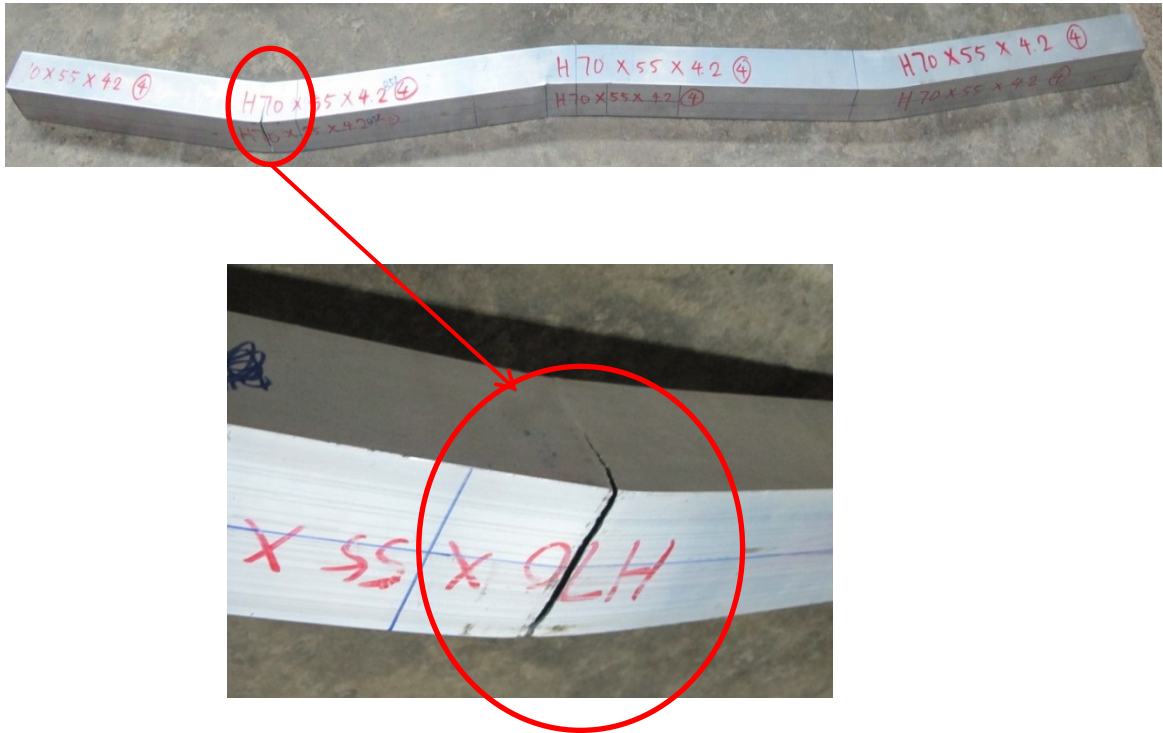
Details of material fracture on the tension flange of specimen (H70×55×4.2B5III)
